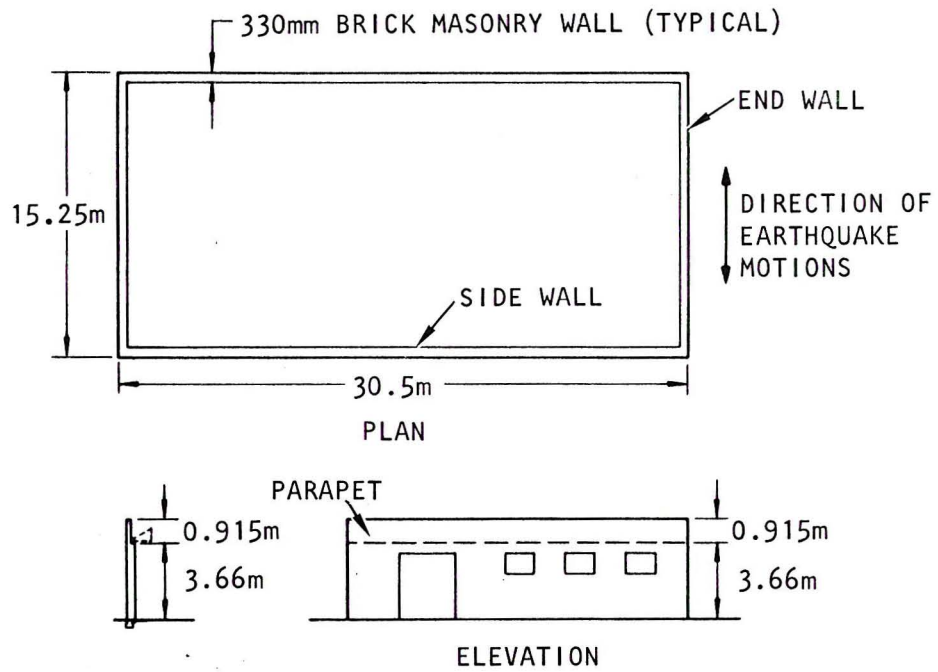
TYPICAL ONE-STORY UNREINFORCED MASONRY BUILDING WITH A WOOD ROOF DIAPHRAGM
